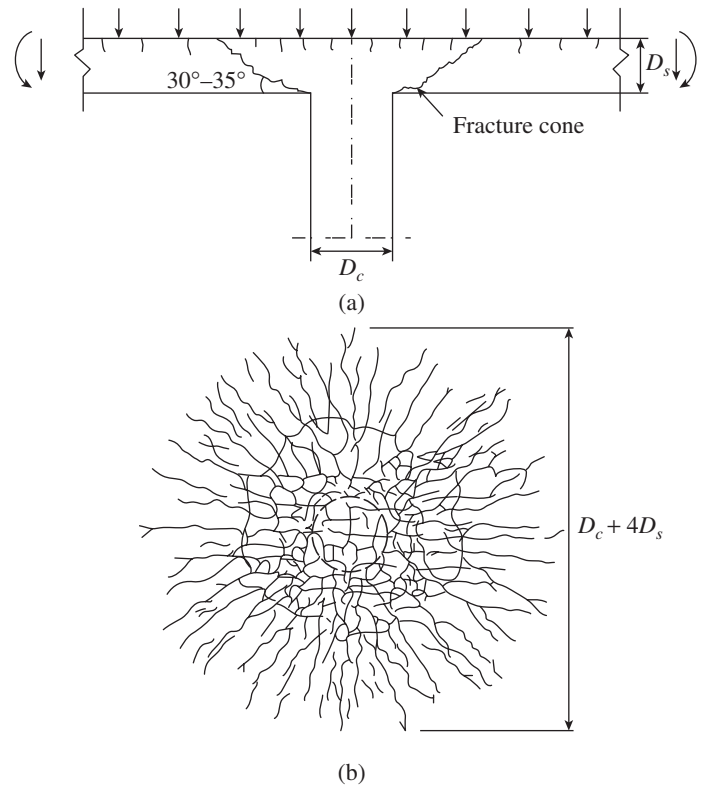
Mode of failure of flat slab in shear (a) Crack pattern section at column (b) Crack pattern at the top of slab
